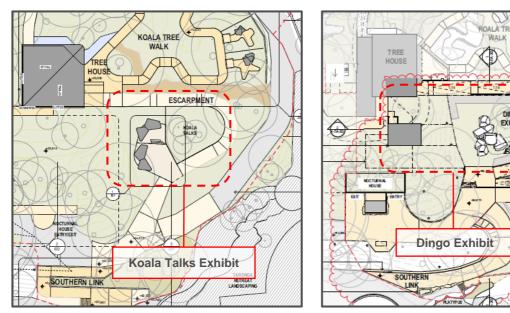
| Exhibit Layout: approved (left), proposed (right) (source: Applicant)
